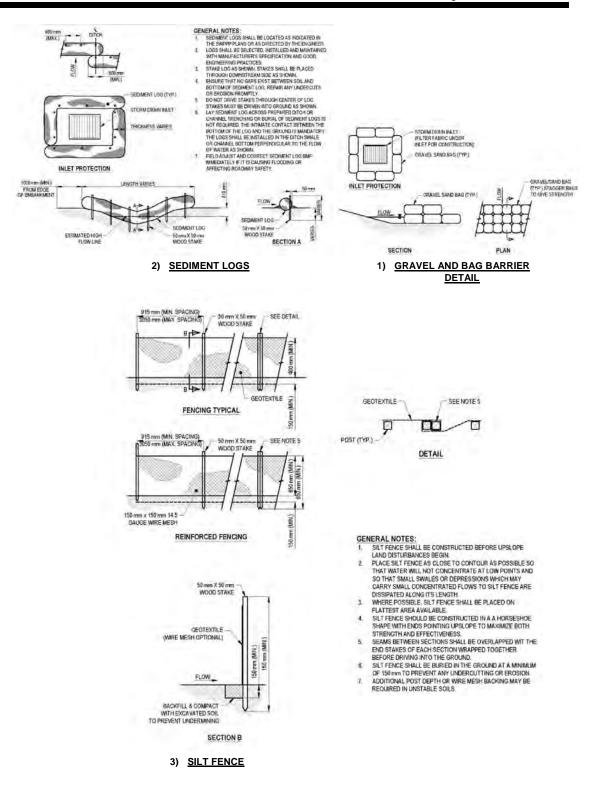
Erosion Control BMP - Sections and Details - Sheet 1 of 2
